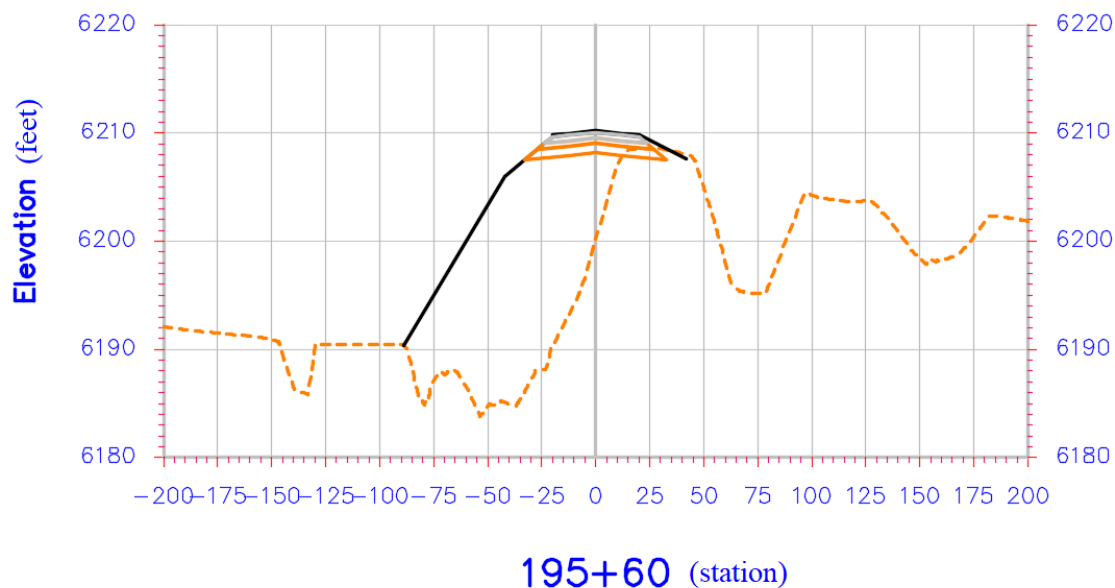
Cross-Section at Station 195+60 Showing Deep Embankment Fill
